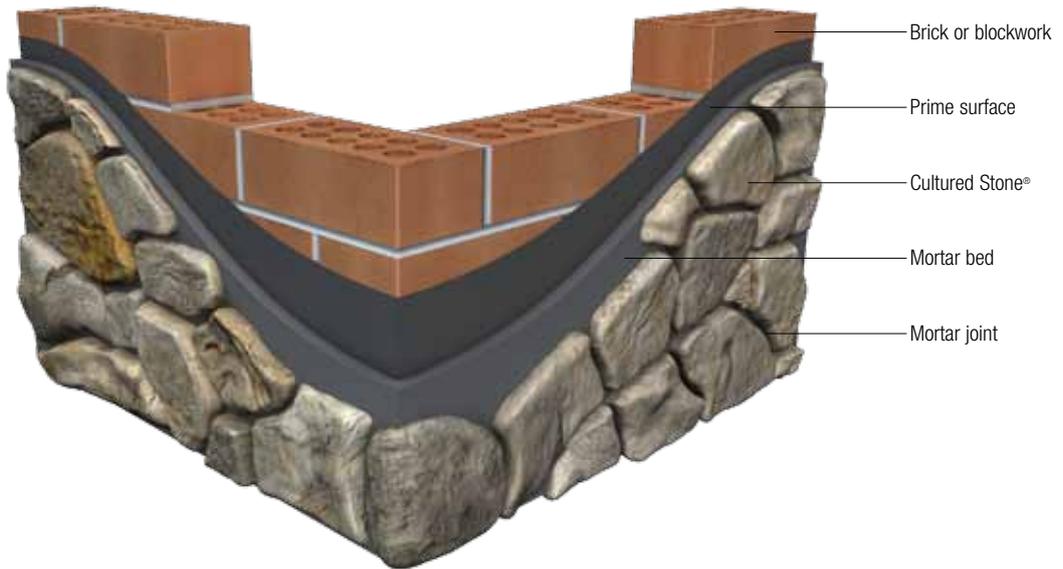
Brick or Block Work Typical Construction (Dwg # CS-01.02)
